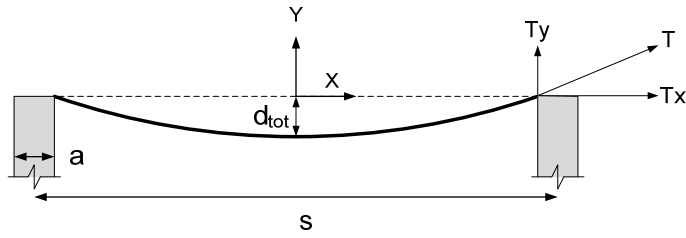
Parabolic approximation for reinforcement spanning adjacent columns
